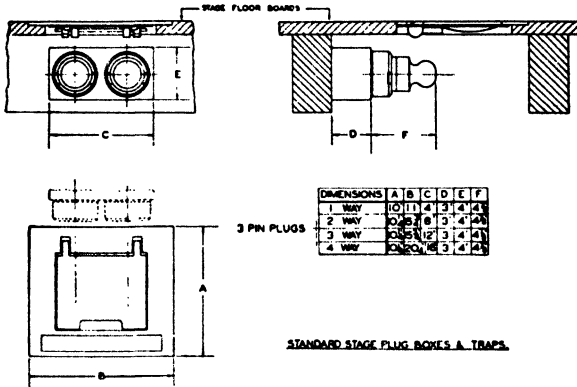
A METHOD OF MOUNTING STAGE PLUGS AND TRAPS
